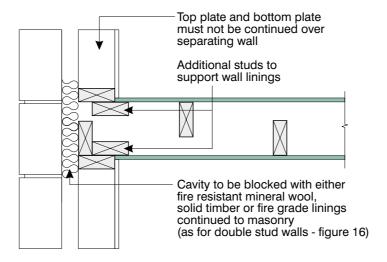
INTERSECTION WITH EXTERNAL BRICK VENEER WALL
